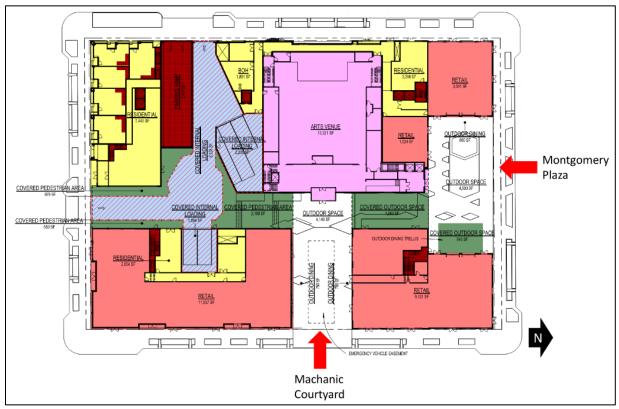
Ground Level uses, and publicly accessible open space located under the building shown in green
